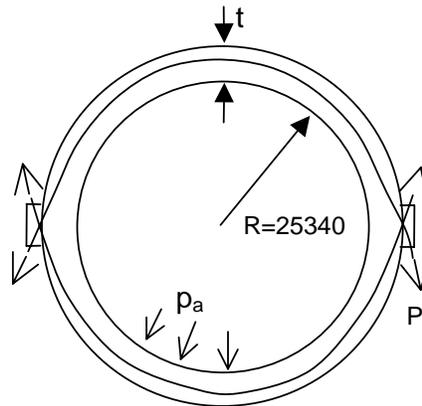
Cross Section of Prestressed Concrete Containment Structure.
